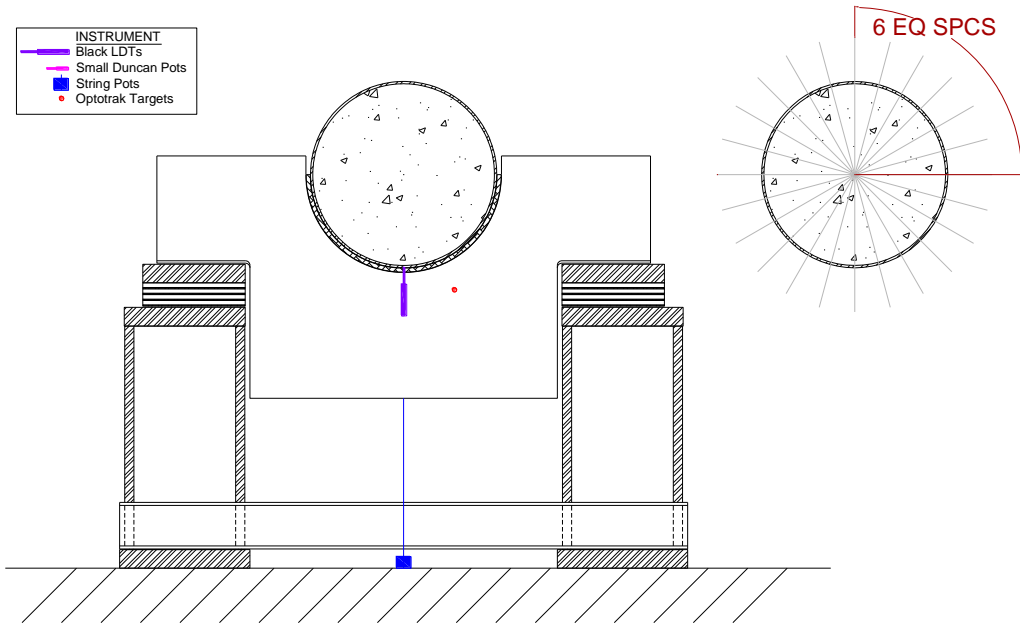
Instrumentation and grid layout common to all specimens (end view)
